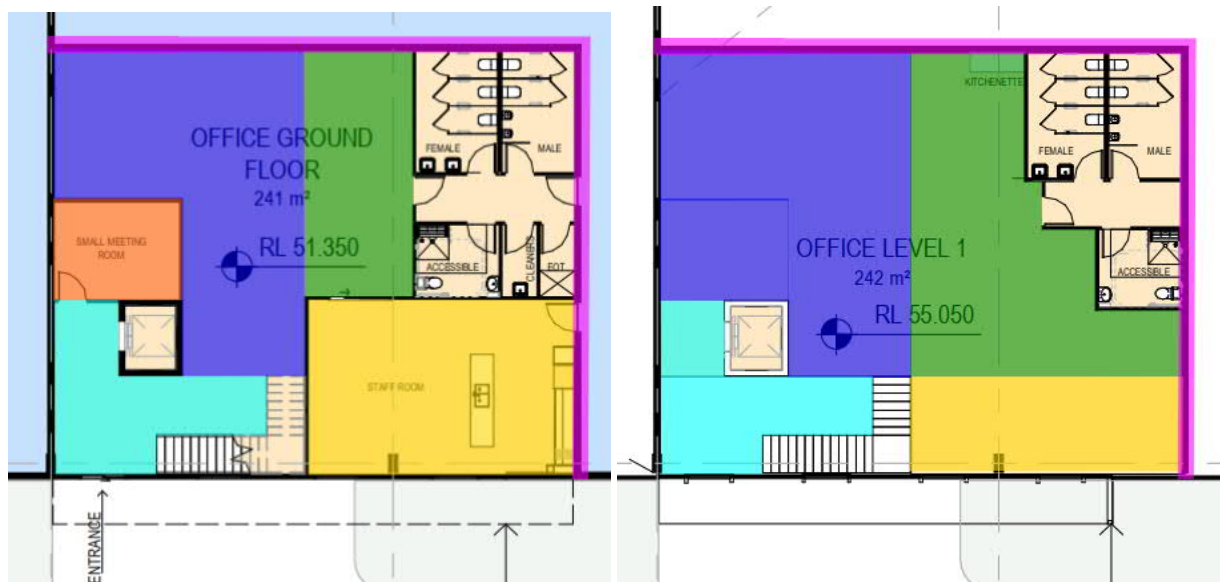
HVAC zones & thermal envelope for 10 Nursery Ave Ground Floor (Left) and First Floor (Right)
